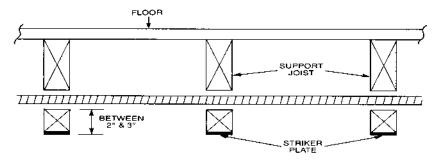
Shielding Requirements at Support Area when Points of Penetration are 2-3 inches from any Edge of a Stud, Joist, Plate, etc.
